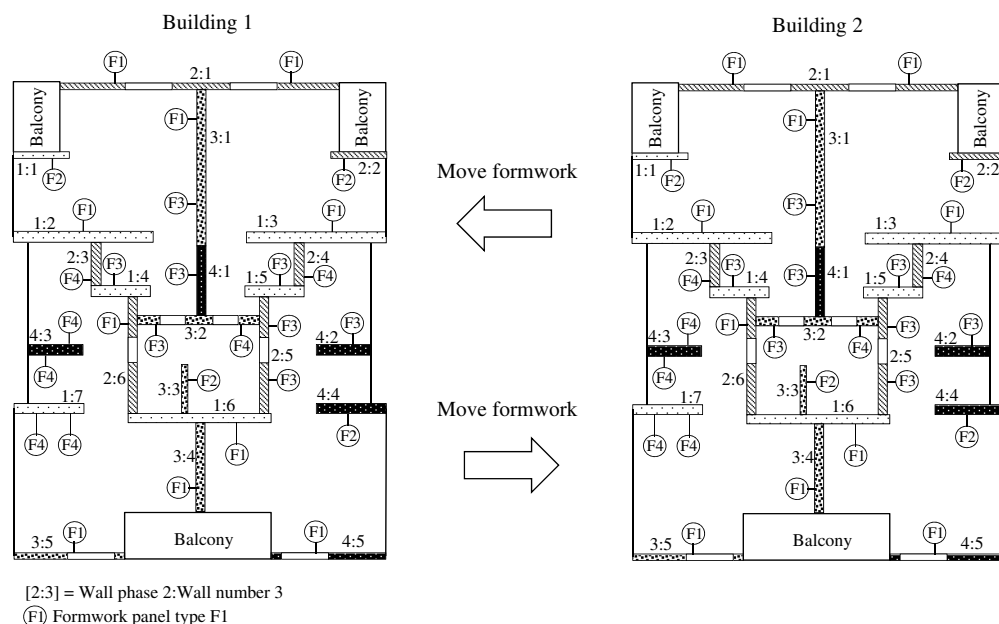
Floor plan layout and construction sequence of walls including formwork usage scheme of the two buildings in Field Project A.
